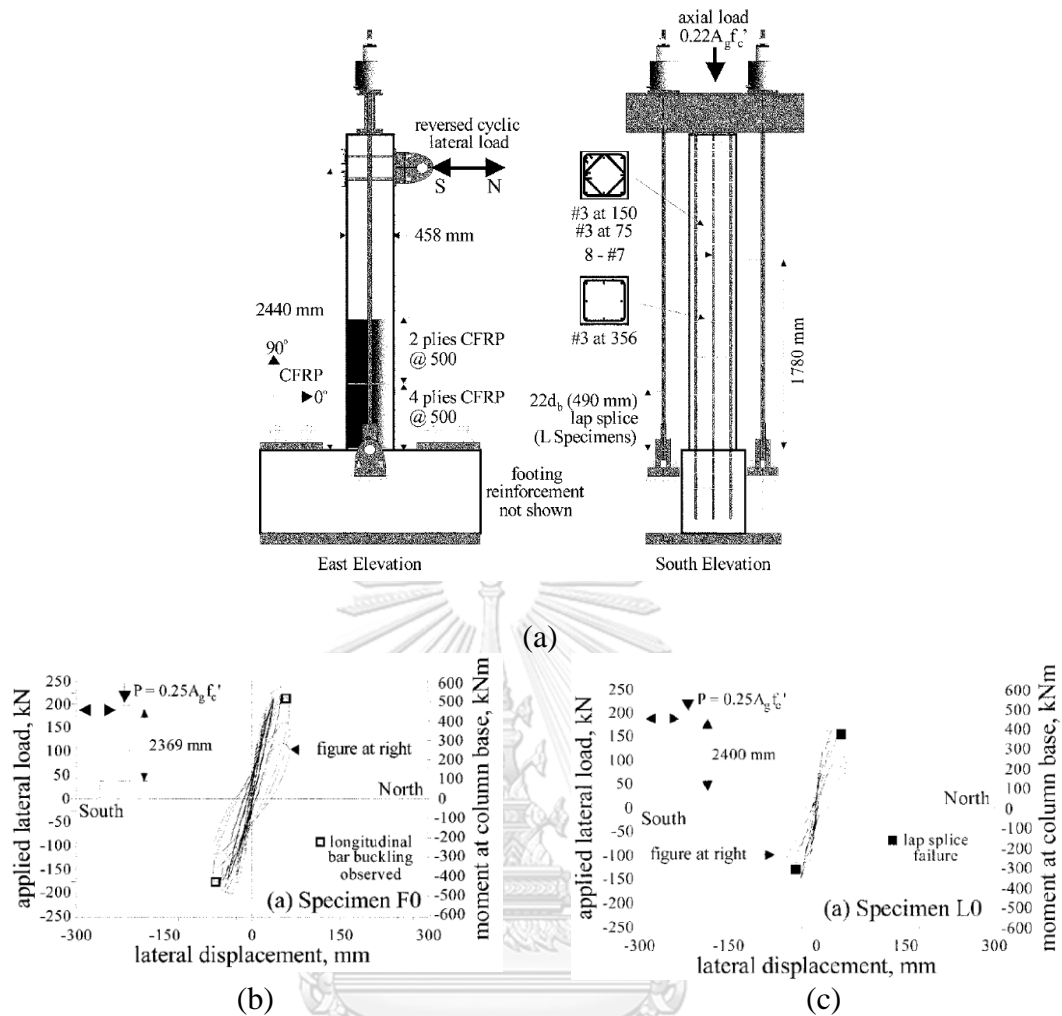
RC columns tested by Herries et al. [35] (a) details, (b) with continuous reinforcement, and (c) with a substandard lap splice.
